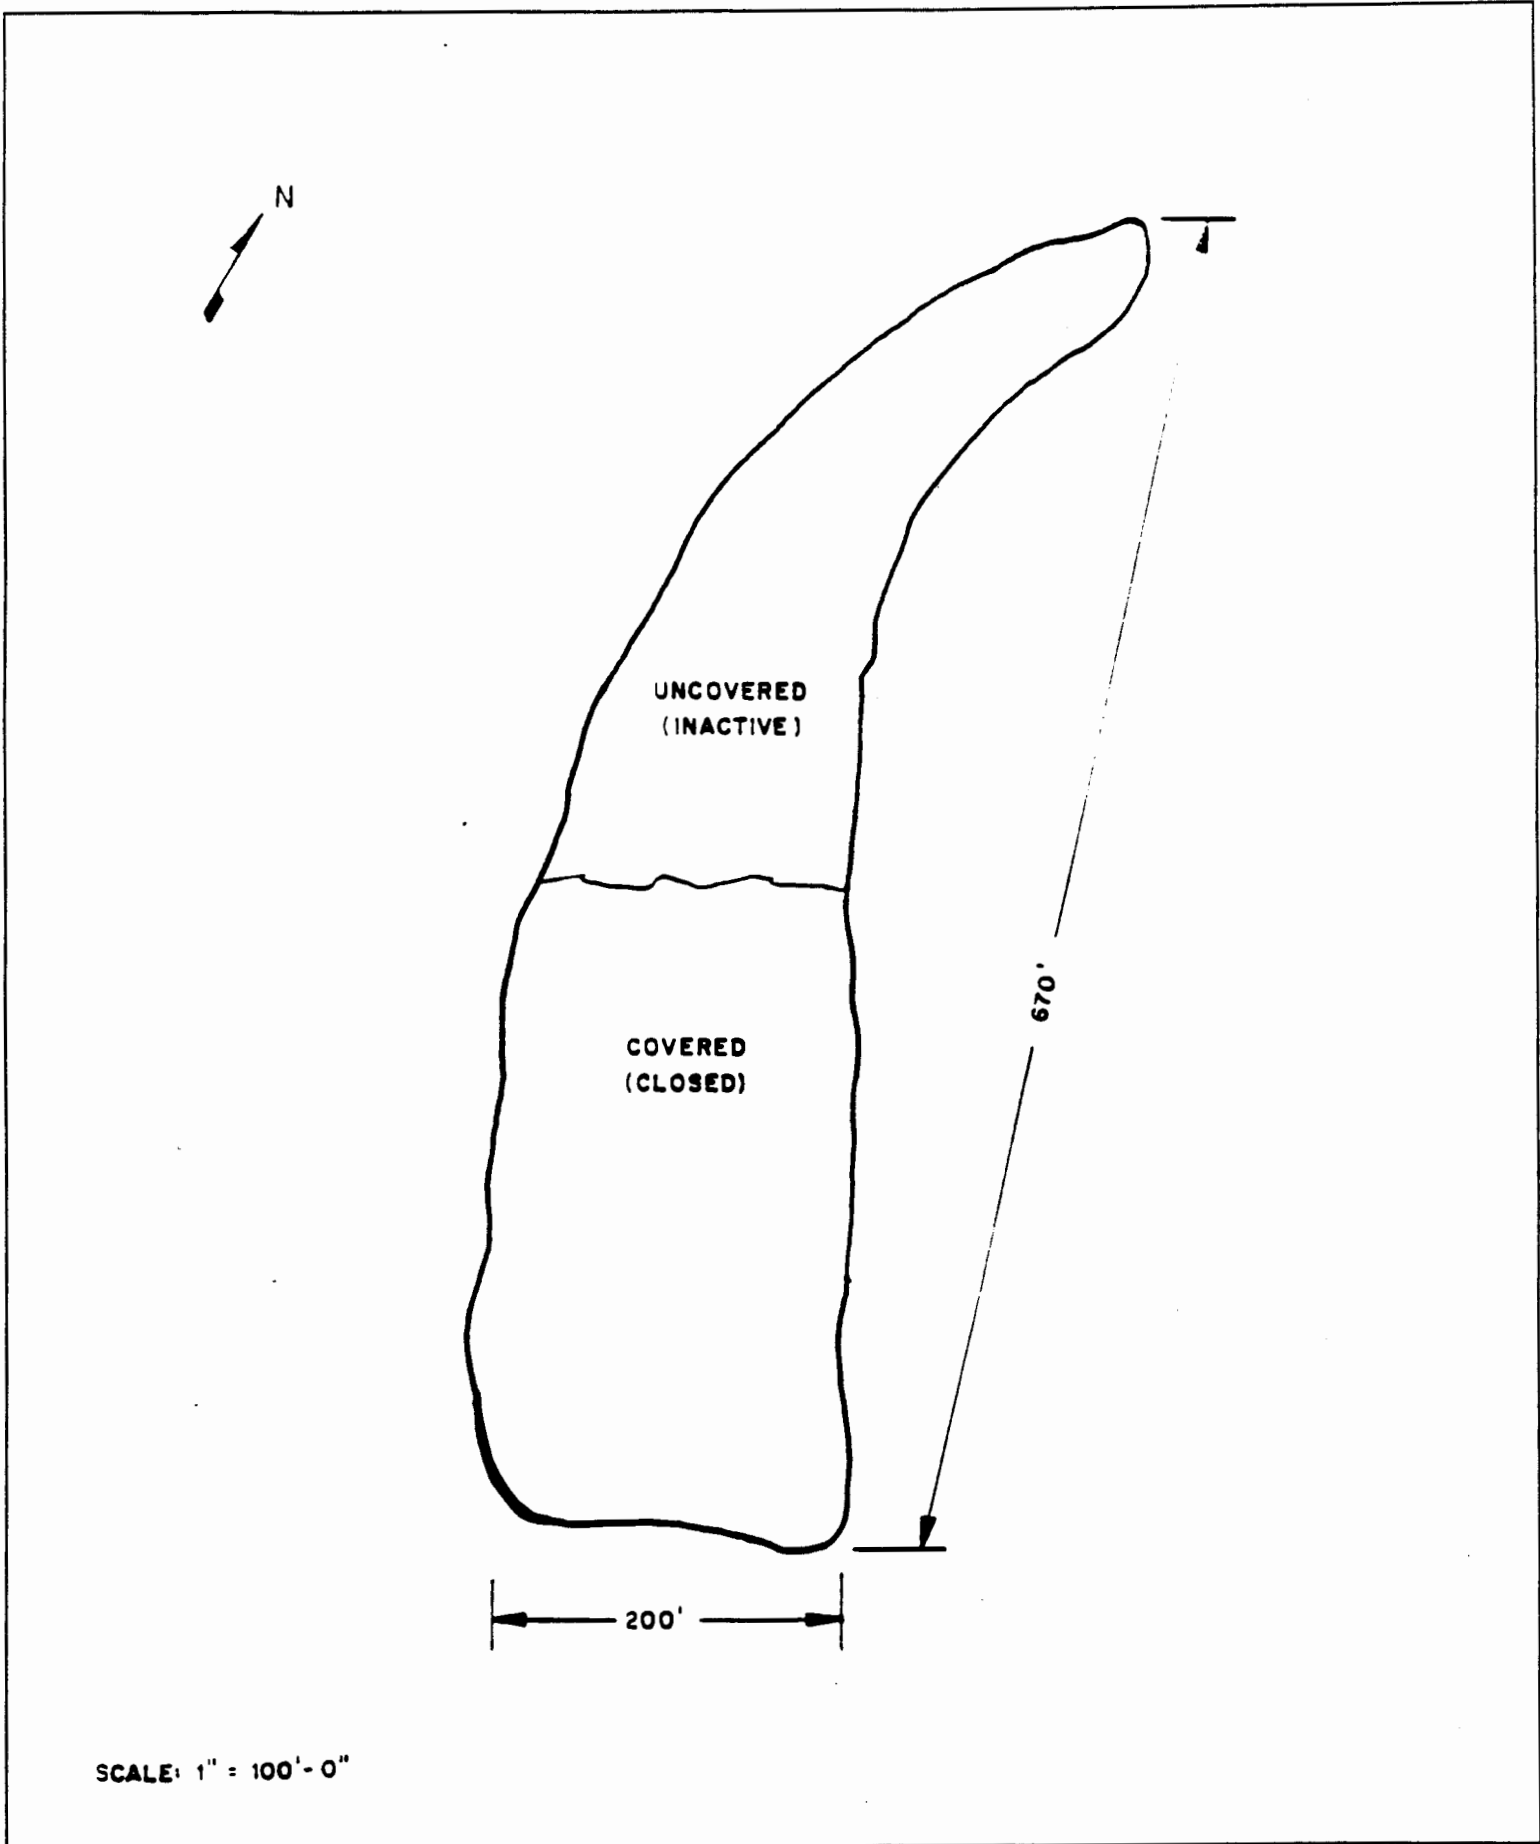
Layout Plan for Old 12 Plant Sludge Basin (SWMU 25)
